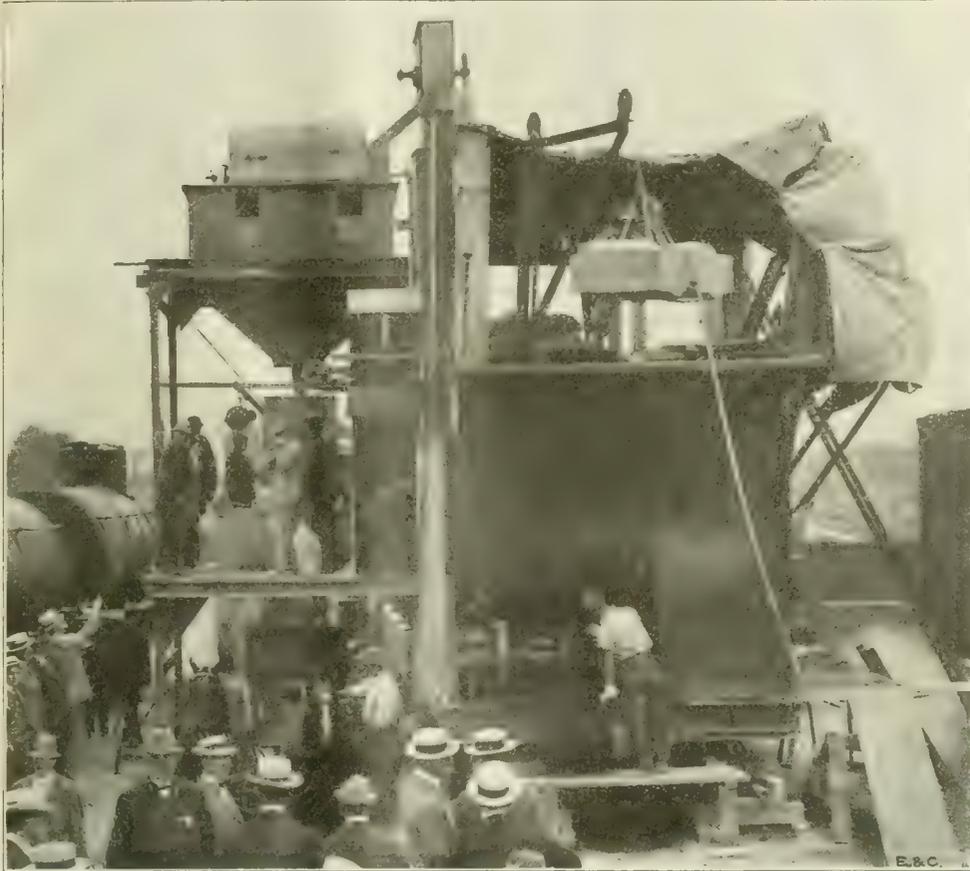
Mixing Plant Showing Method of Loading Wagons.
